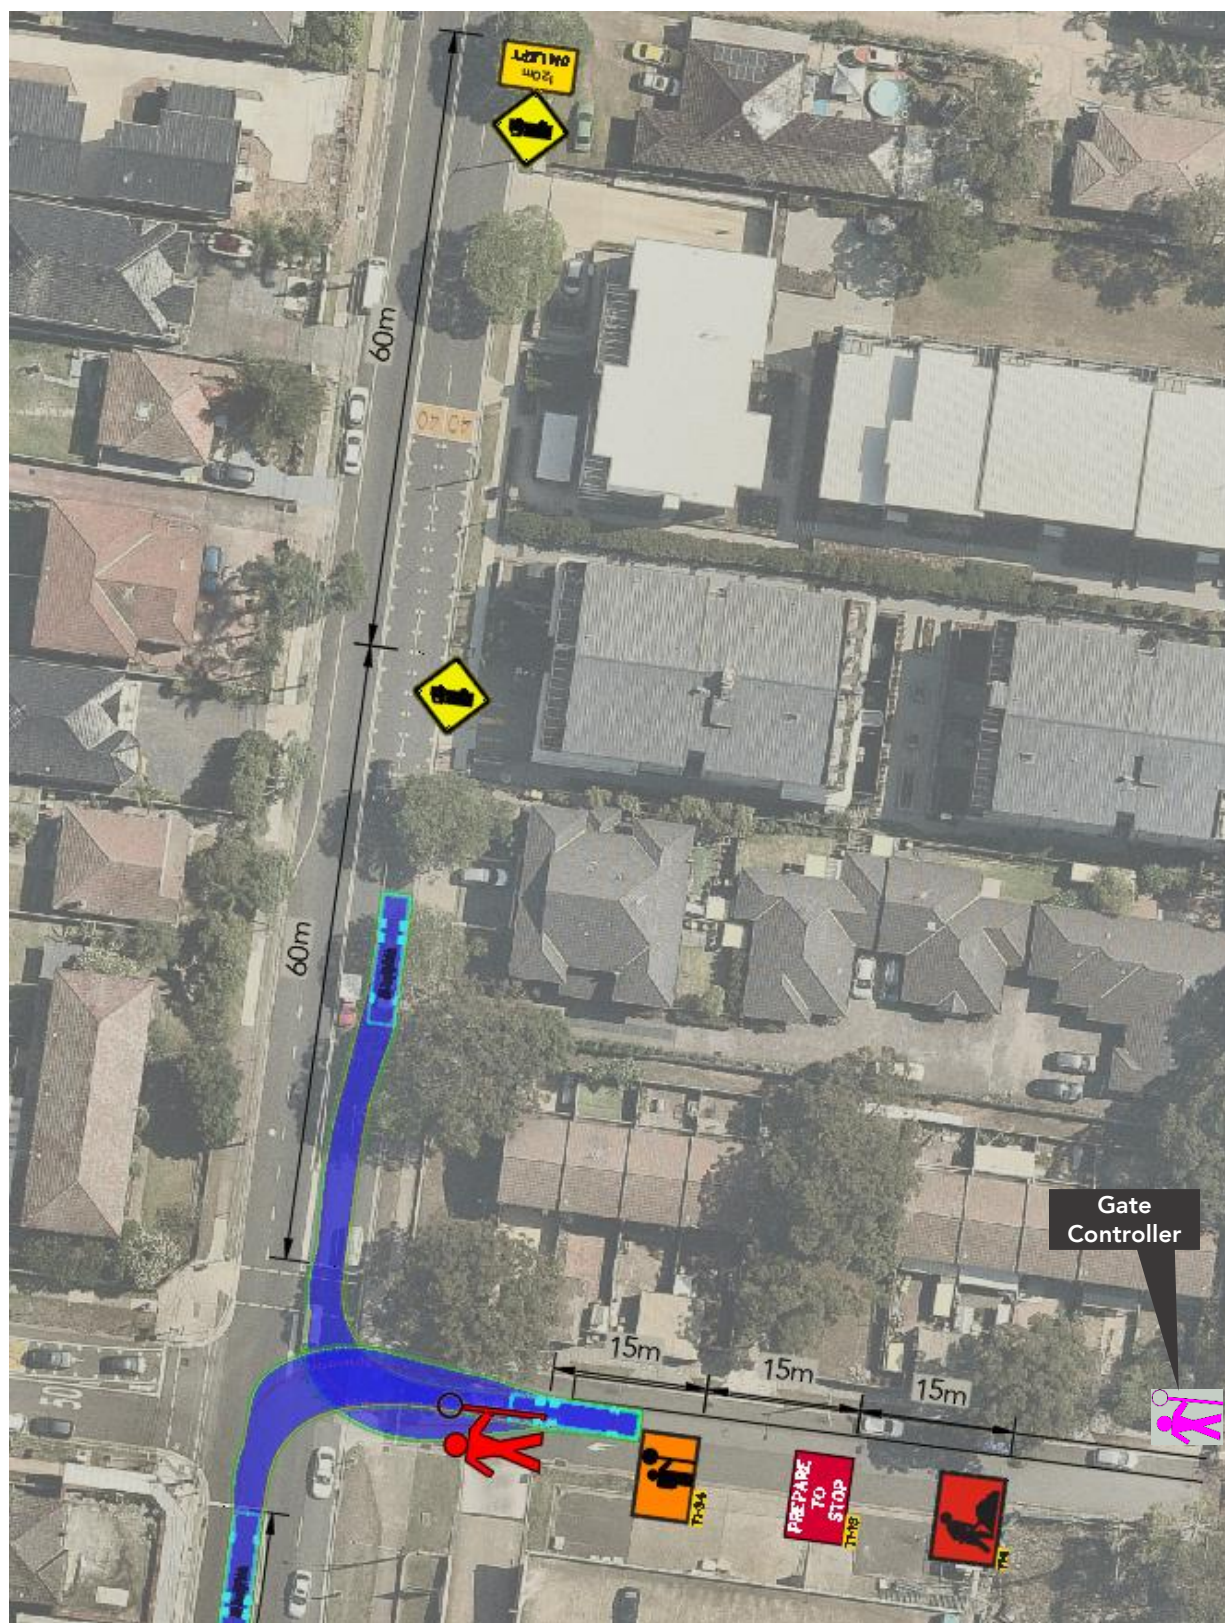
TCP 77 and TCP 195 at Davis Lane and southbound Rockwood Road
